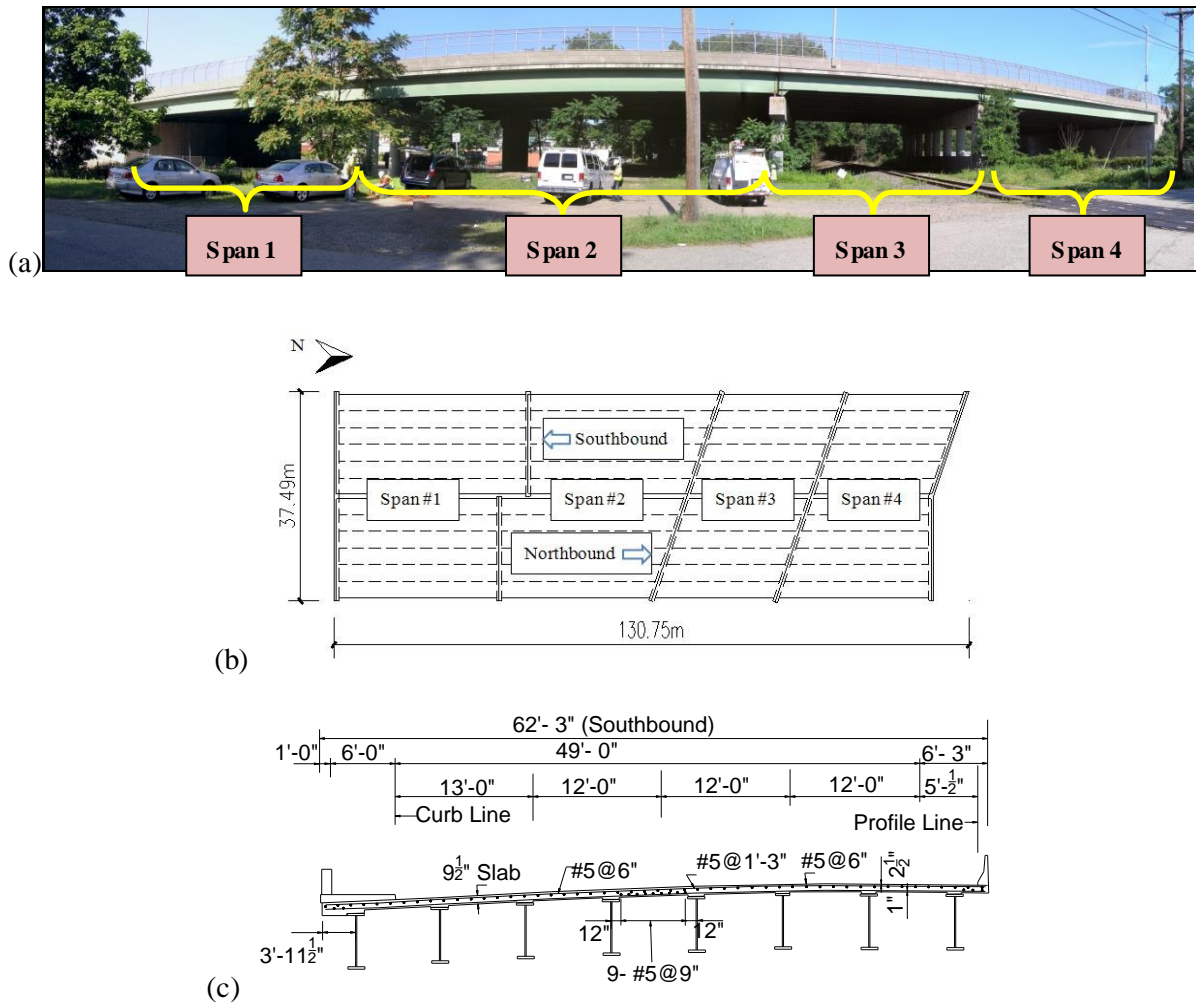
(a) Photo of the bridge; (b) Schematic of the bridge; (c) Cross section of the tested span
